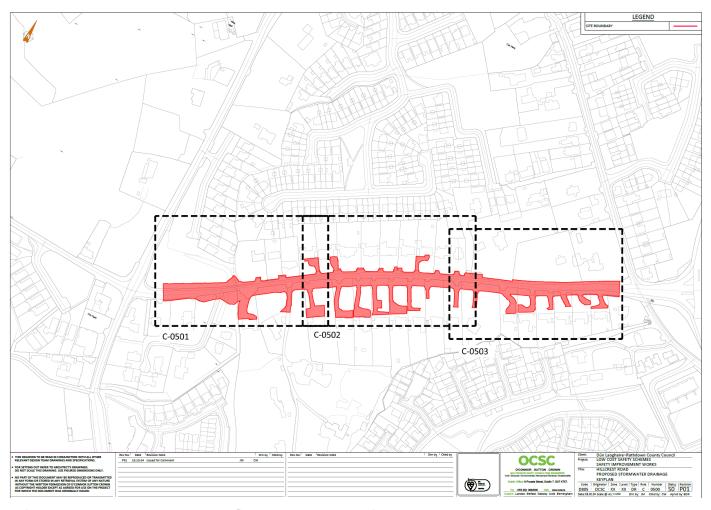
Hillcrest Road Proposed Stormwater Drainage Key plan
